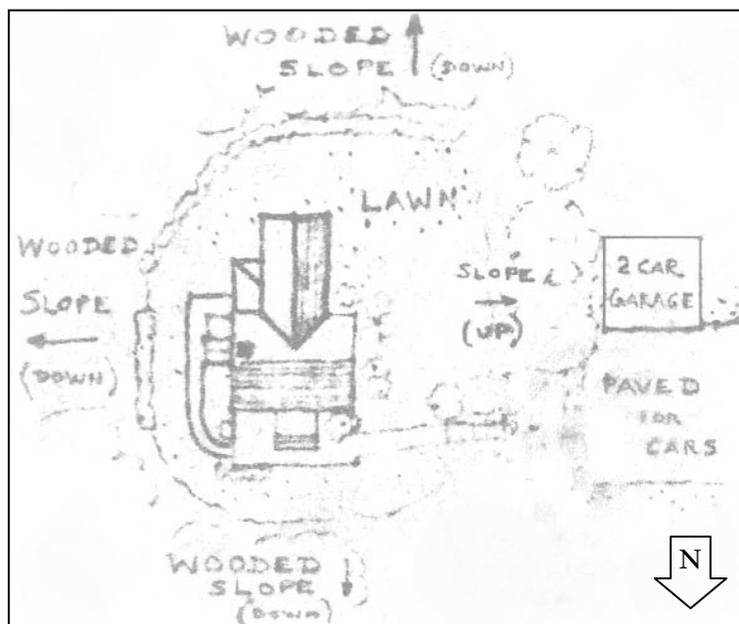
Gray Cottage plot plan depicting building, garage, paved parking area, and landscape features and slopes, 1964.
